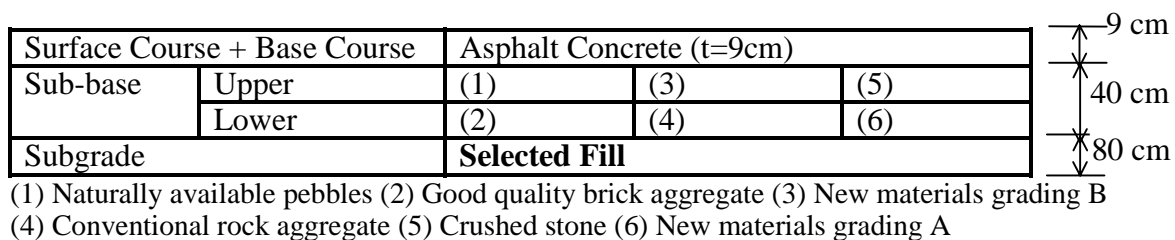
Details of typical section of model test road. (Total=30 m x 3 sectors=90 m).
